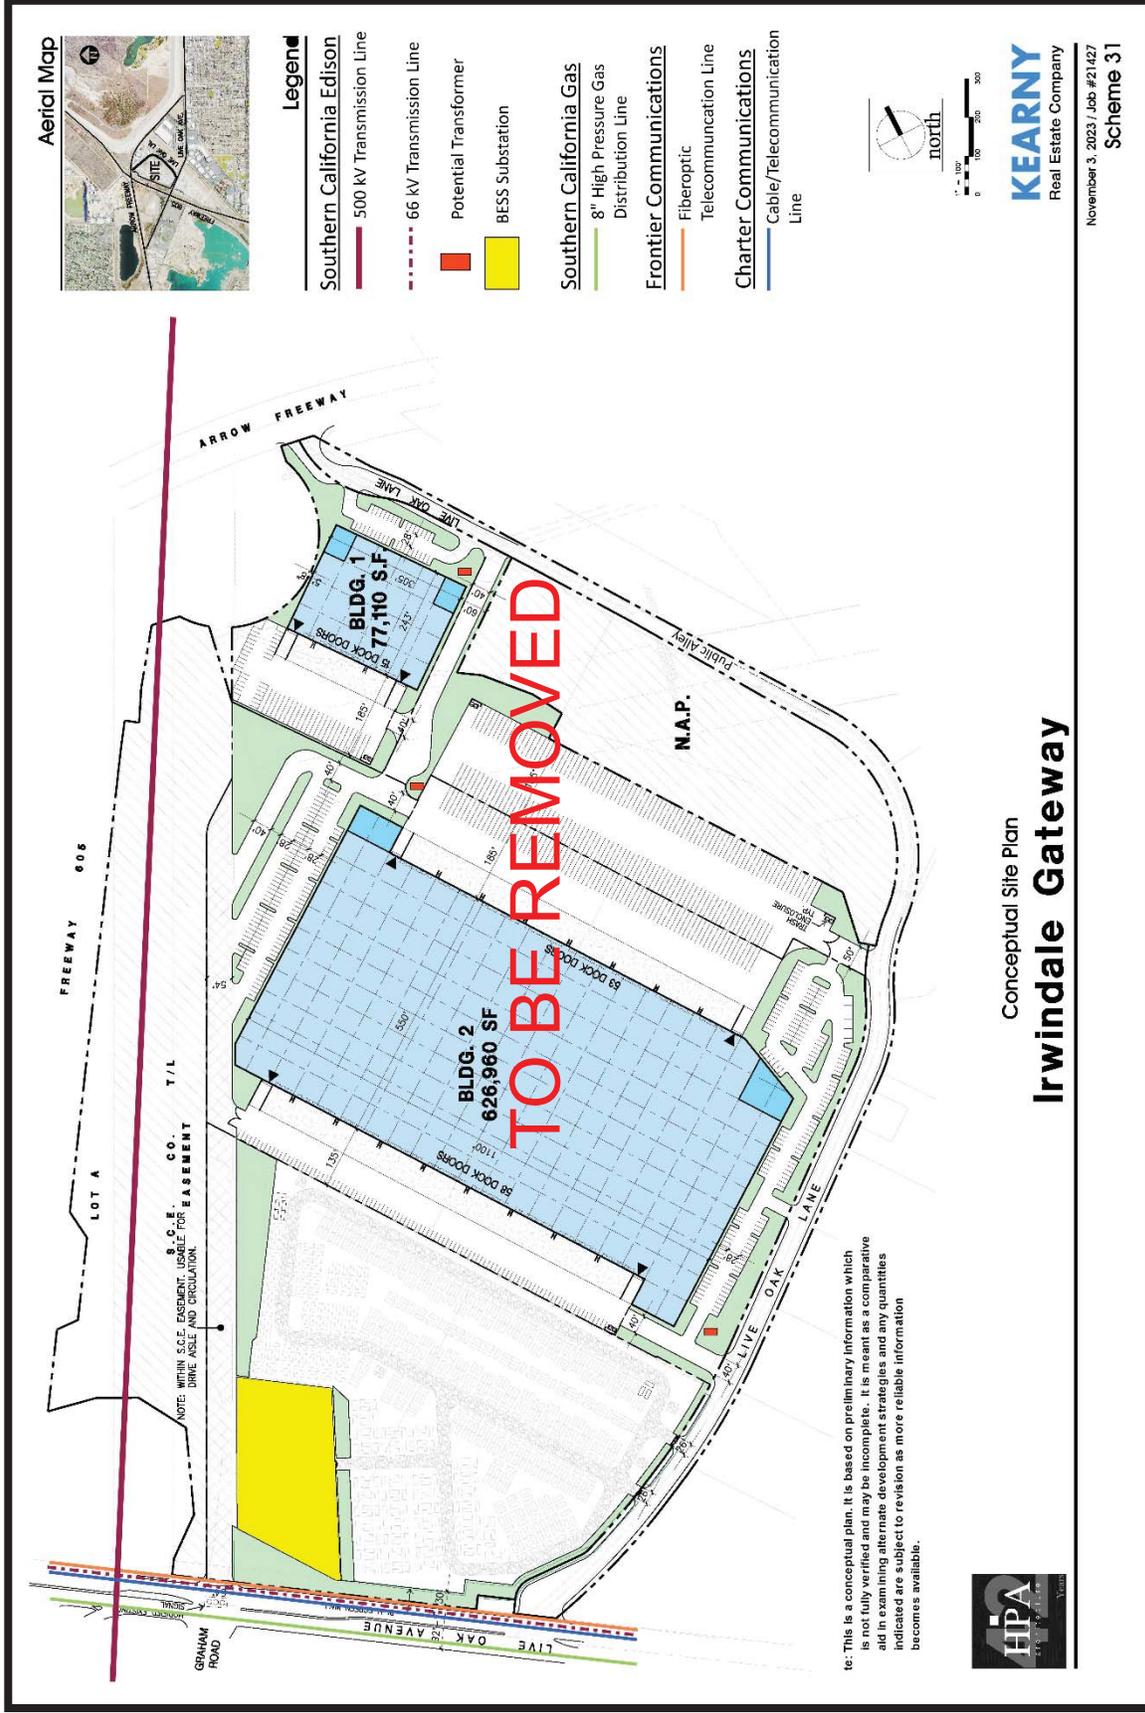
CONCEPTUAL DRY UTILITIES PLAN WITH BESS
